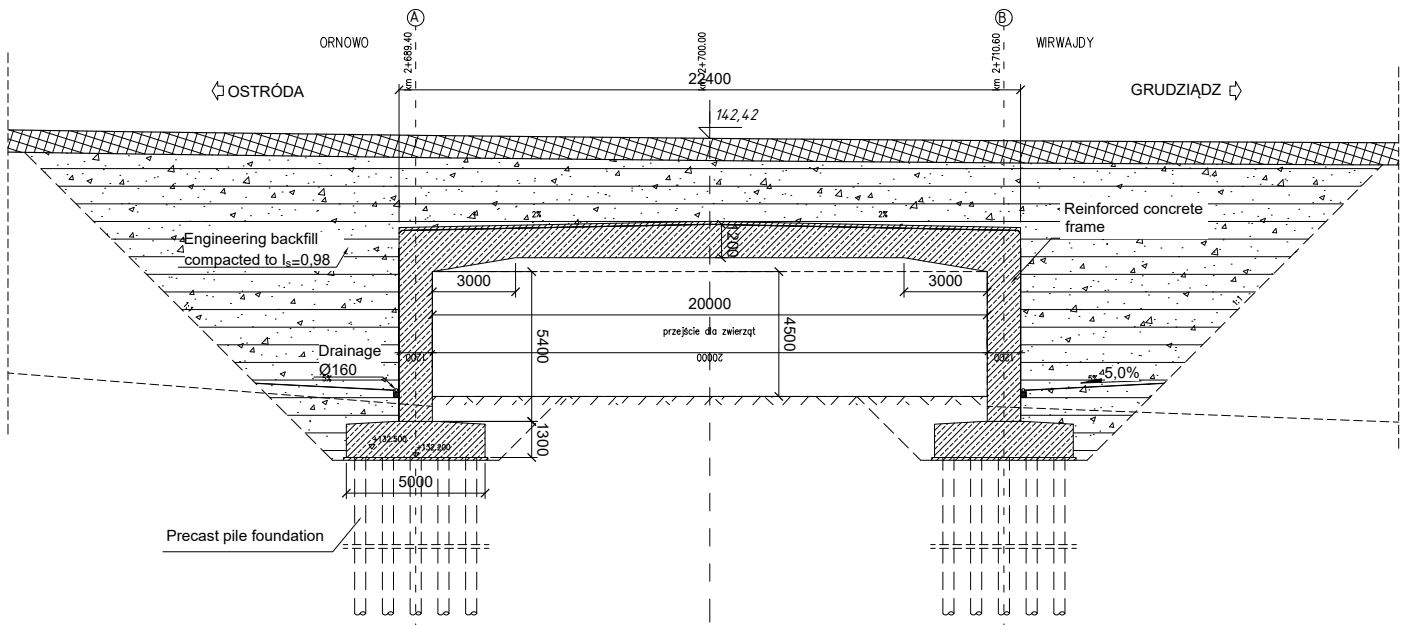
The reinforced concrete bridge (RCB) as wild life underpass solution
